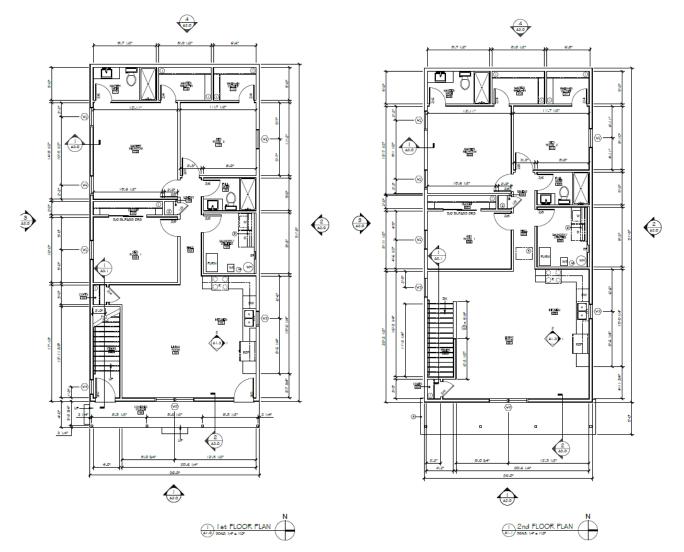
Floor plans of the two apartments of the proposed duplex.
